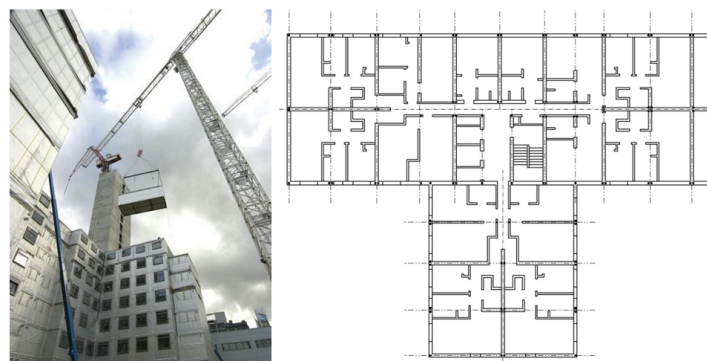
Case 2: The Paragon: Core structure (left) with modular arrangement (right)[9]
